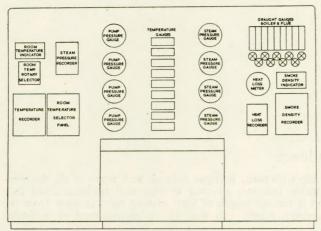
Revised arrangement of thermometers and gauges for heating installation
